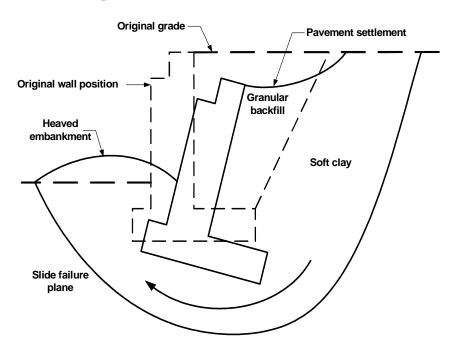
Lateral Movement of an Abutment due to Slope Failure
